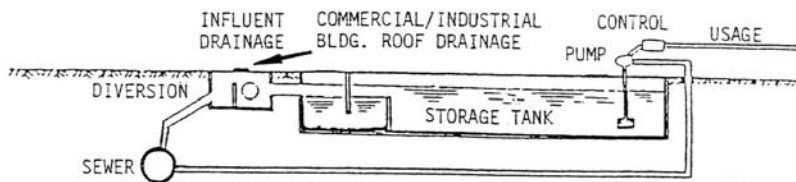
(b). Roof drainage harvesting facility for commercial and industrial buildings (Preul, 1994)
